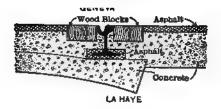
Street-railway Track Construction at Geneva and La Haye.
